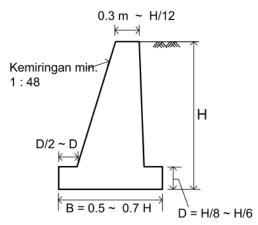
Typical Dimensions of Gravity Retaining Wall (SNI 8460:2017)
